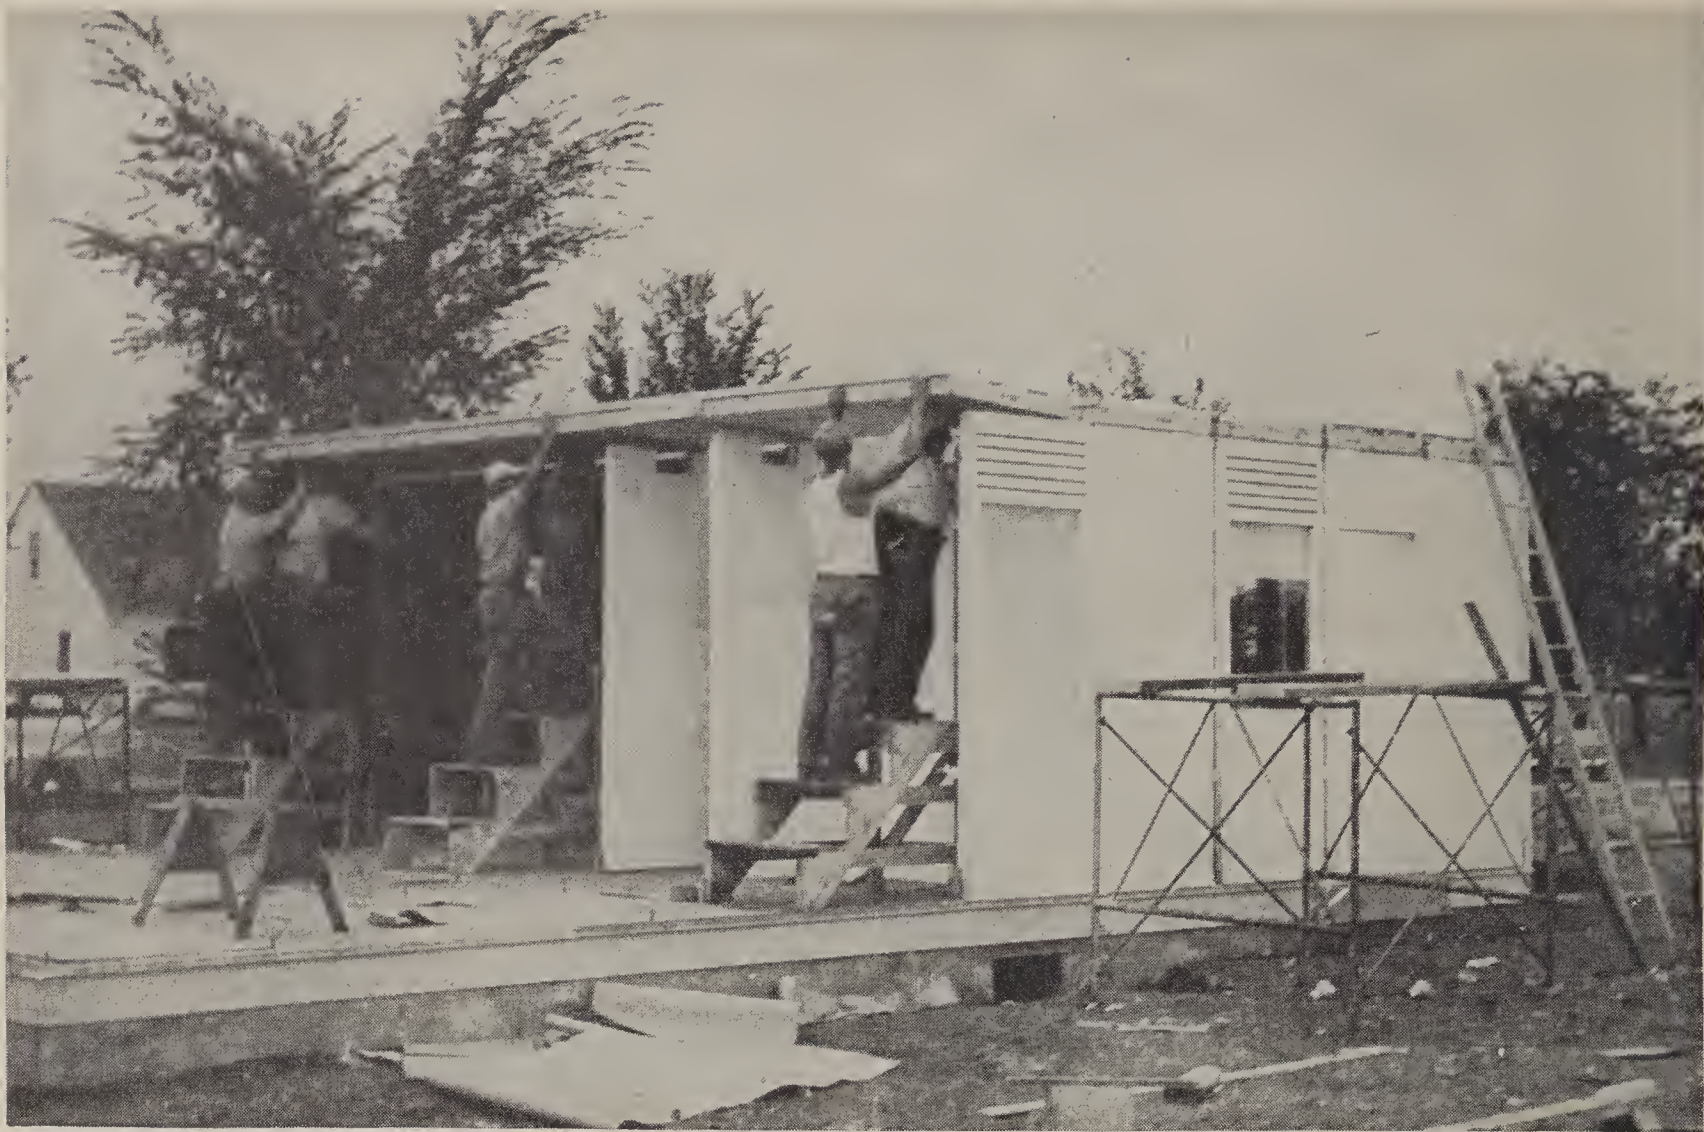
Long stressed-cover plywood roof panels being erected in a prefabricated house.
